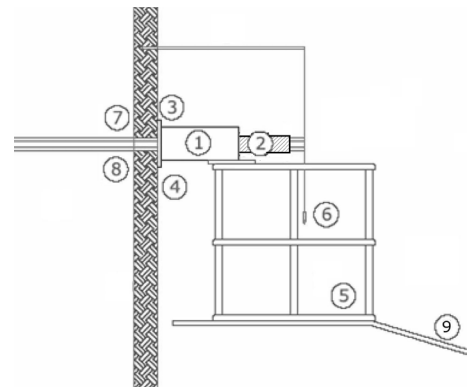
In situ pull out test set up and devices: 1) hydraulic jack, 2) steel head used as a gripper, 3) stiff steel plate, 4) ball joint, 5) platform for operator, 6) plumblines, 7) reinforcing element, 8) excavation face, 9) mechanical device for platform positioning
